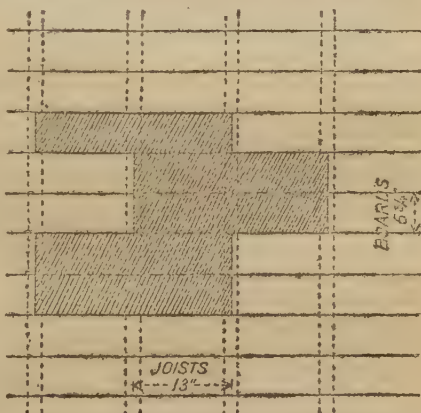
REPAIRING DEFECTIVE FLOOR
